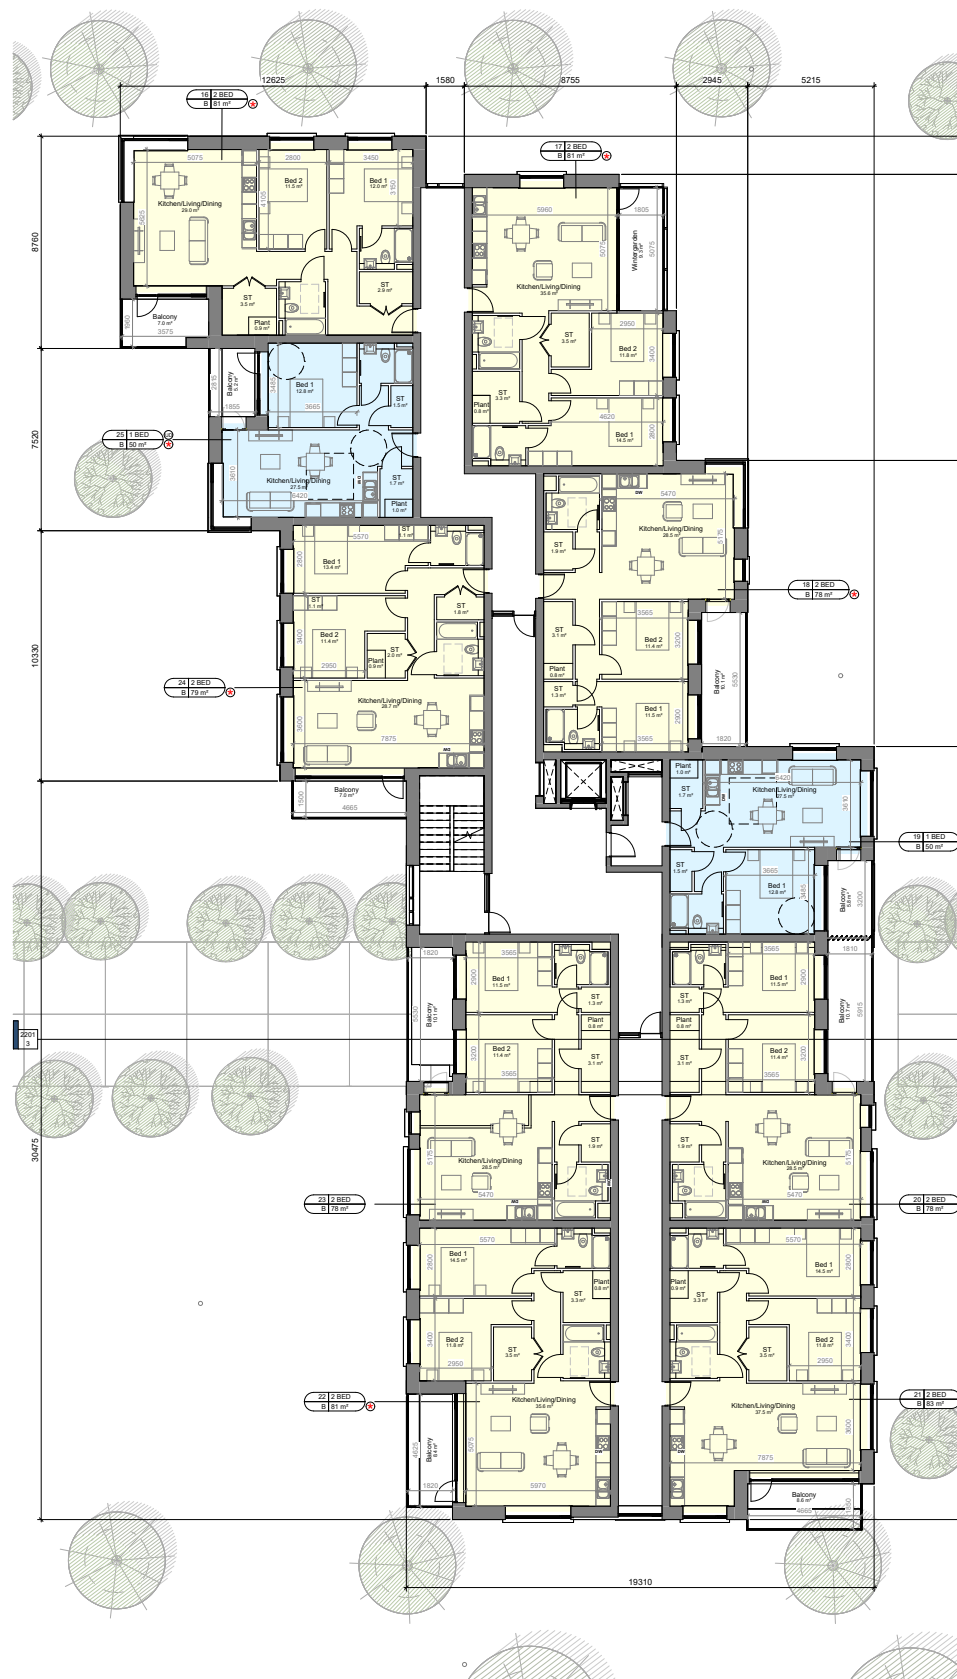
Block B - Second- Fifth Floor Plan Source: MCORM, 2026.
